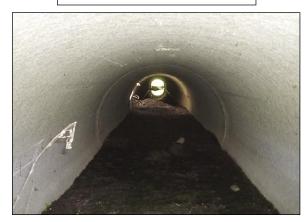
Bayview Avenue Extension-Tunnel Monitoring
